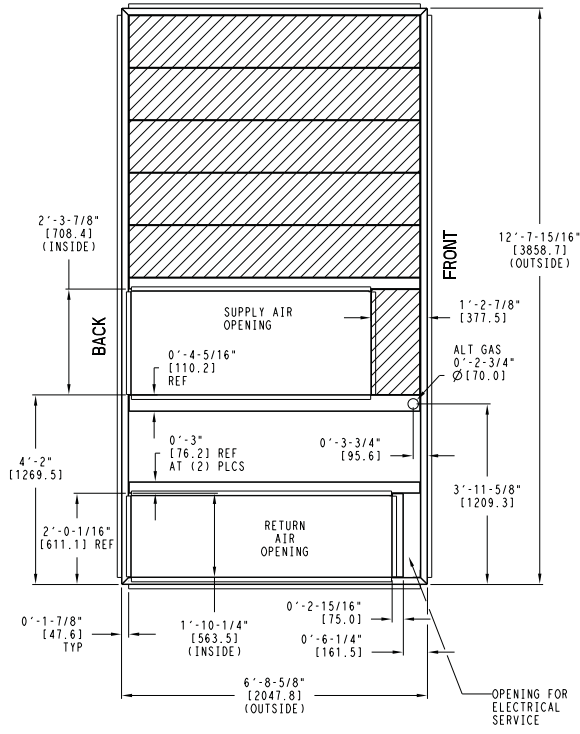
Dimensions 50LC*B24, 26, Sheet 3 of 3
